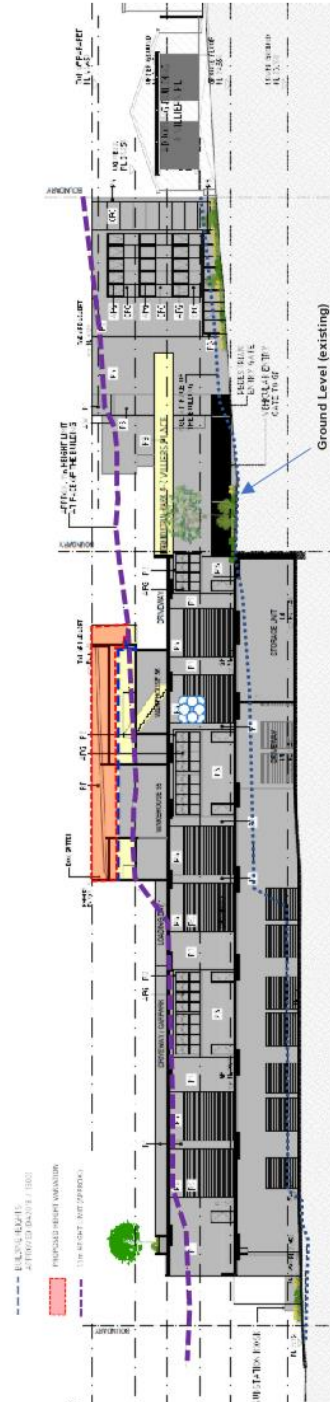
Section D demonstrating the proposed variation (outlined in red). (Source: PBD Architects)
